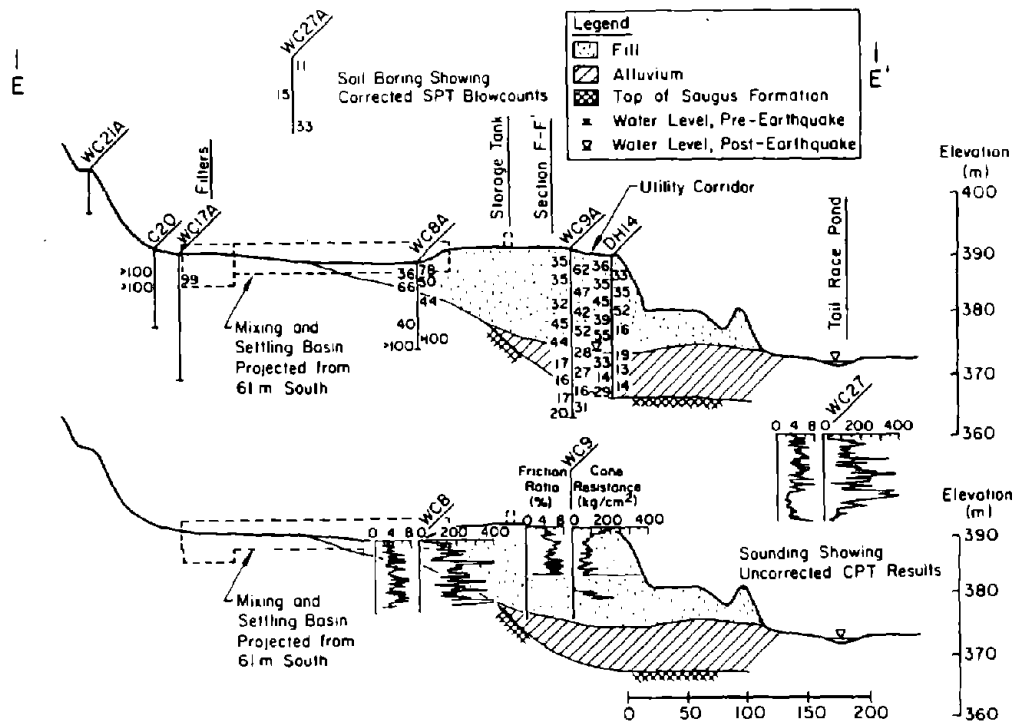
Soil Profile at Cross-Section E-E', Joseph Jensen Filtration Plant
